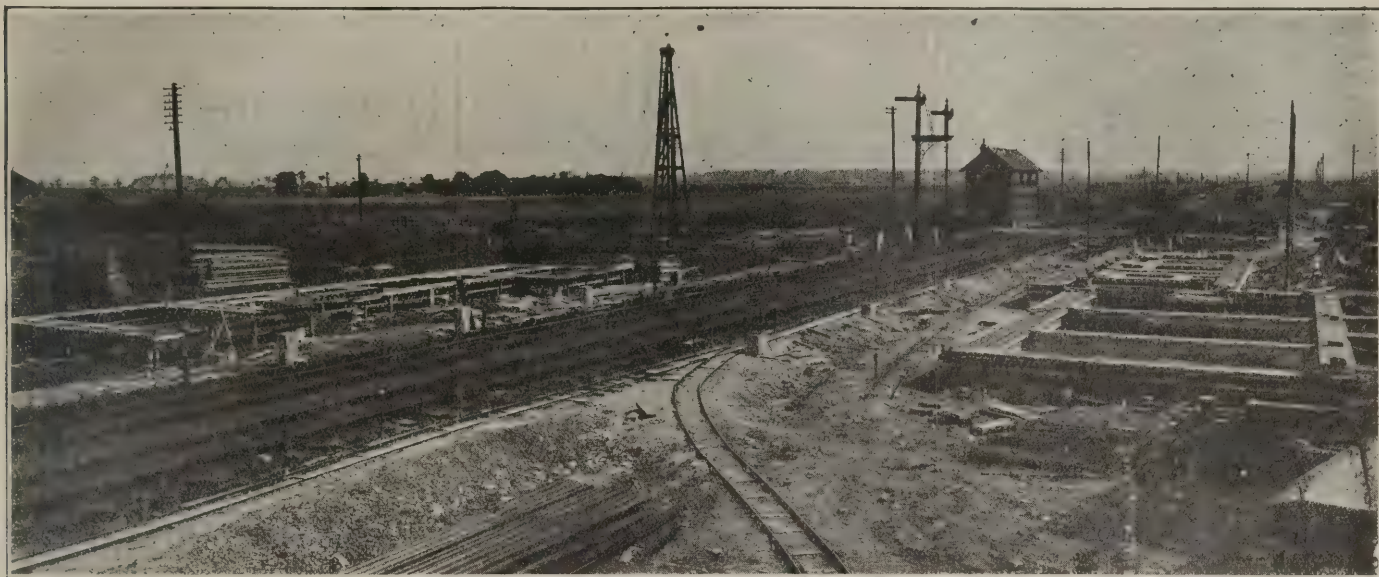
FOUNDATIONS OF DAGENHAM DOCK STATION
